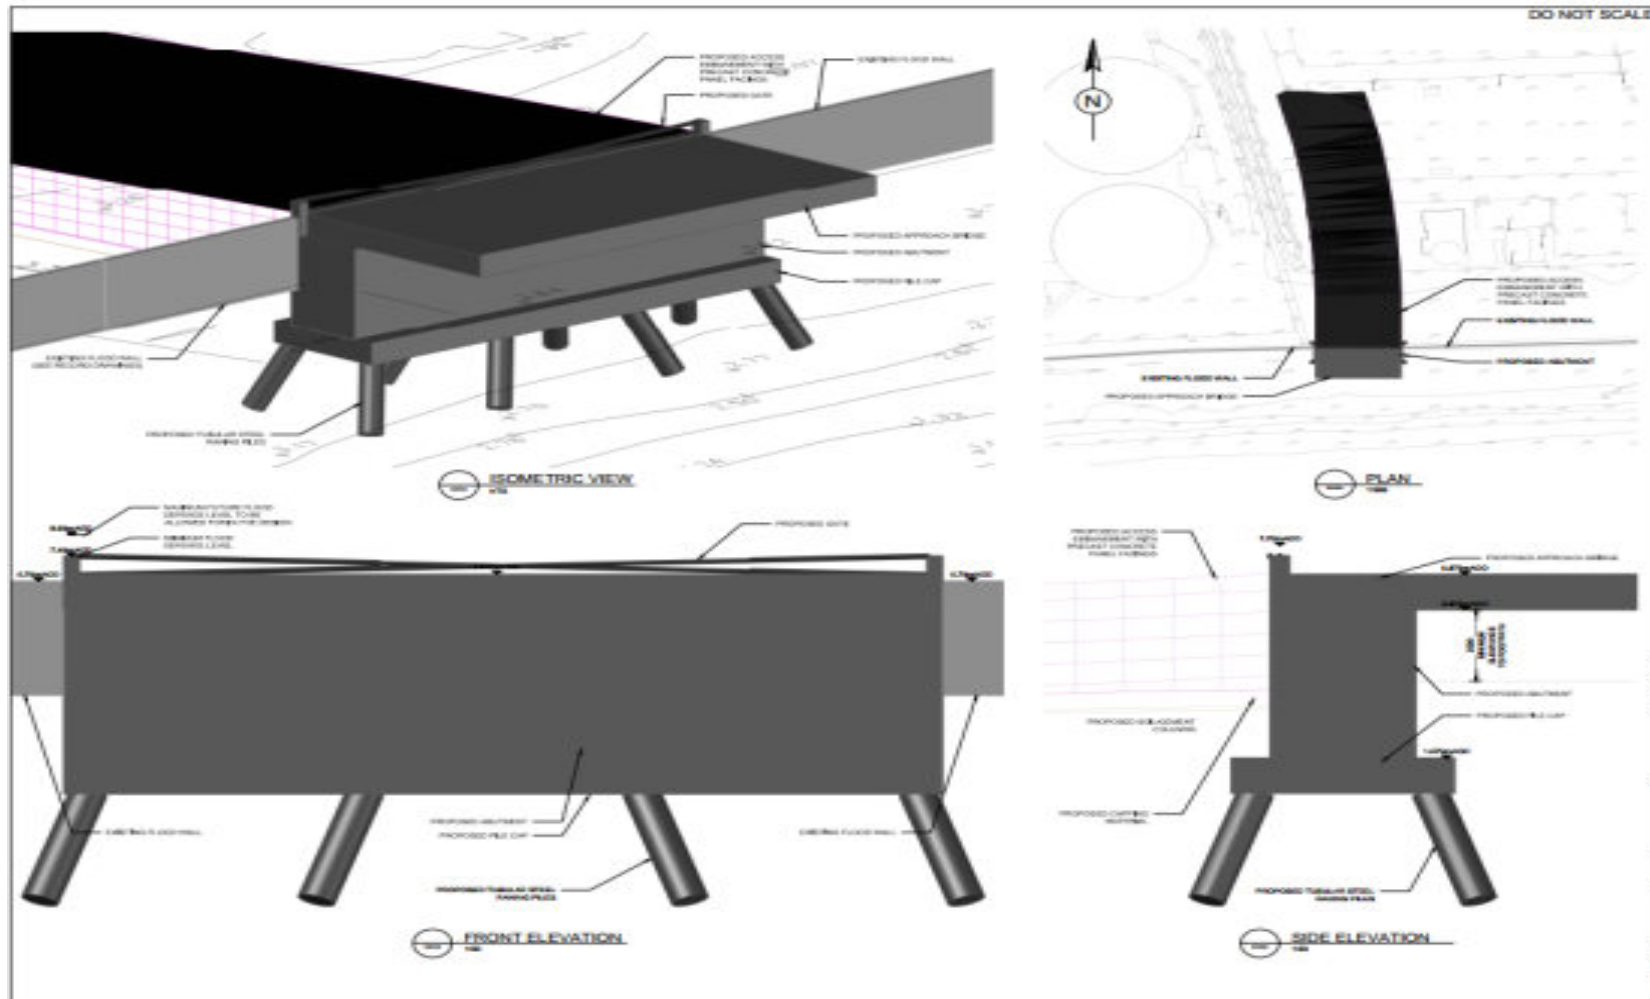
Proposed bridge gate interaction with existing floodwall
